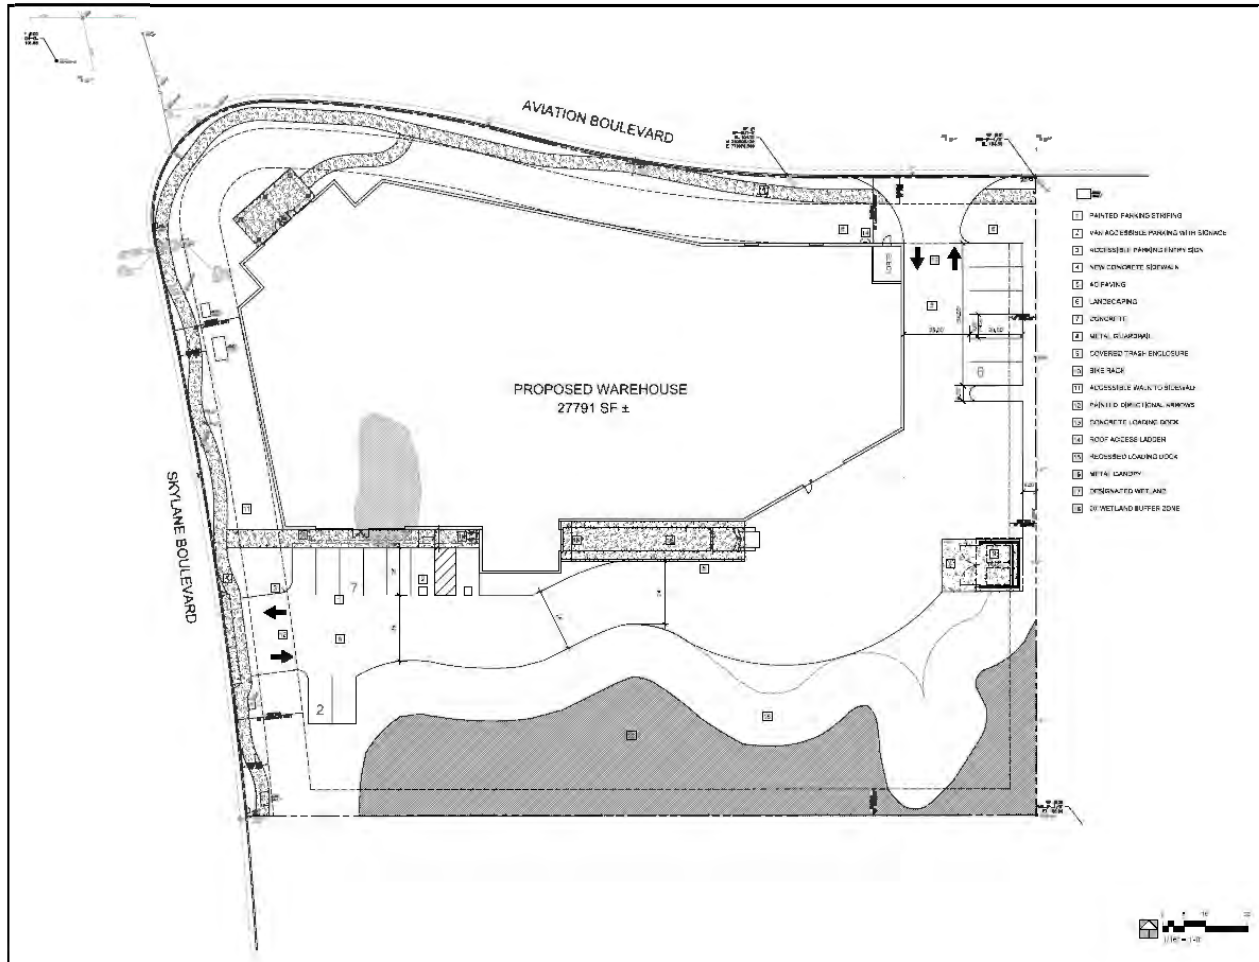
Site Plan with seasonal wetlands on-site (2) shaded
